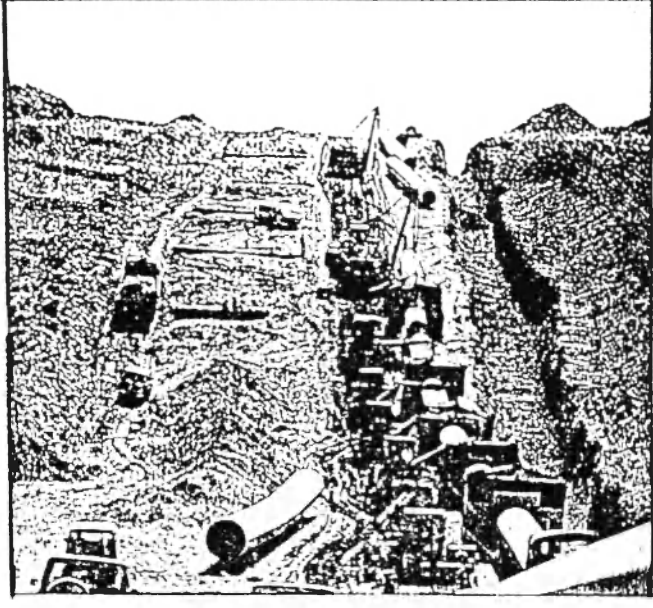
Typical field setting for automatic Pipe line welding operation.
